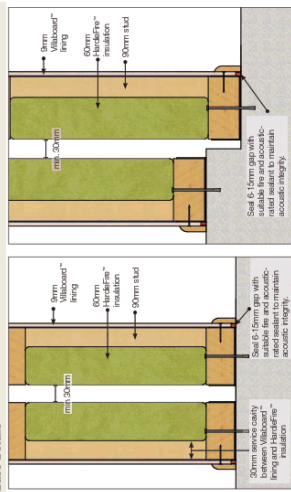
HARDIESMART™ INTERTEKNACY WALL SYSTEM BASE TO SLOPED SLAB DETAIL
